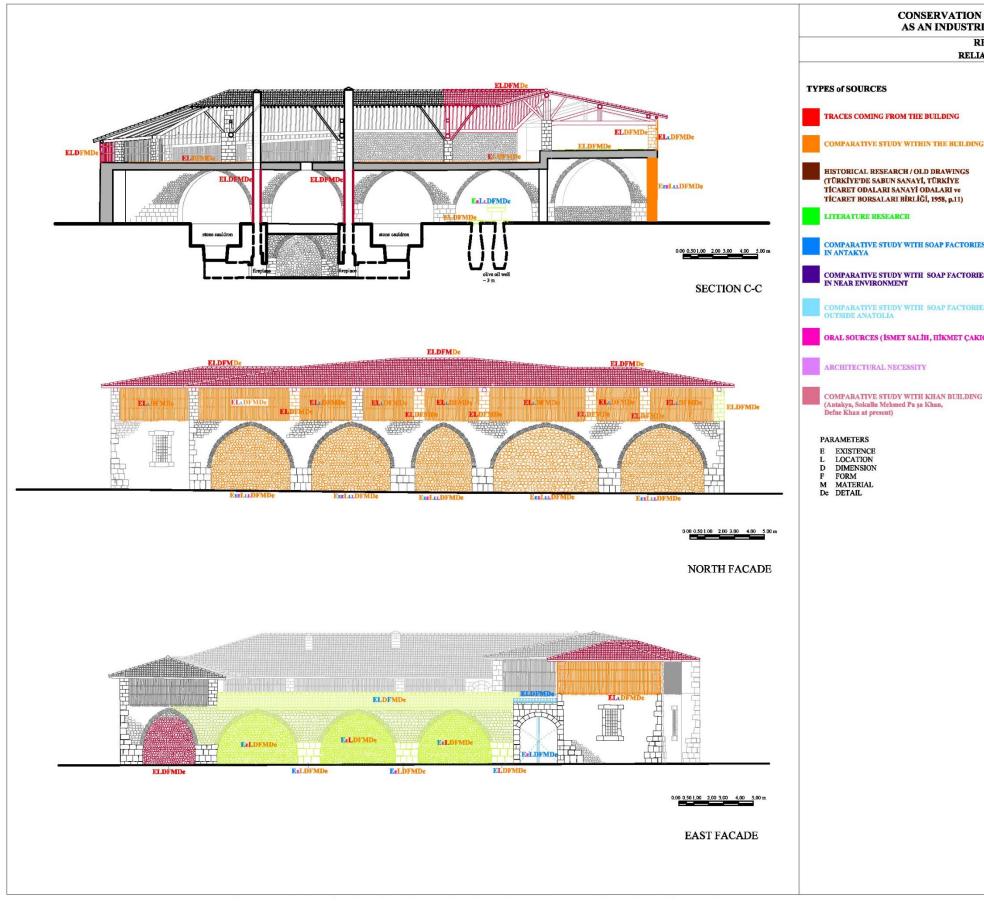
Restitution drawings – Section C-C, East Facade and North Facade
